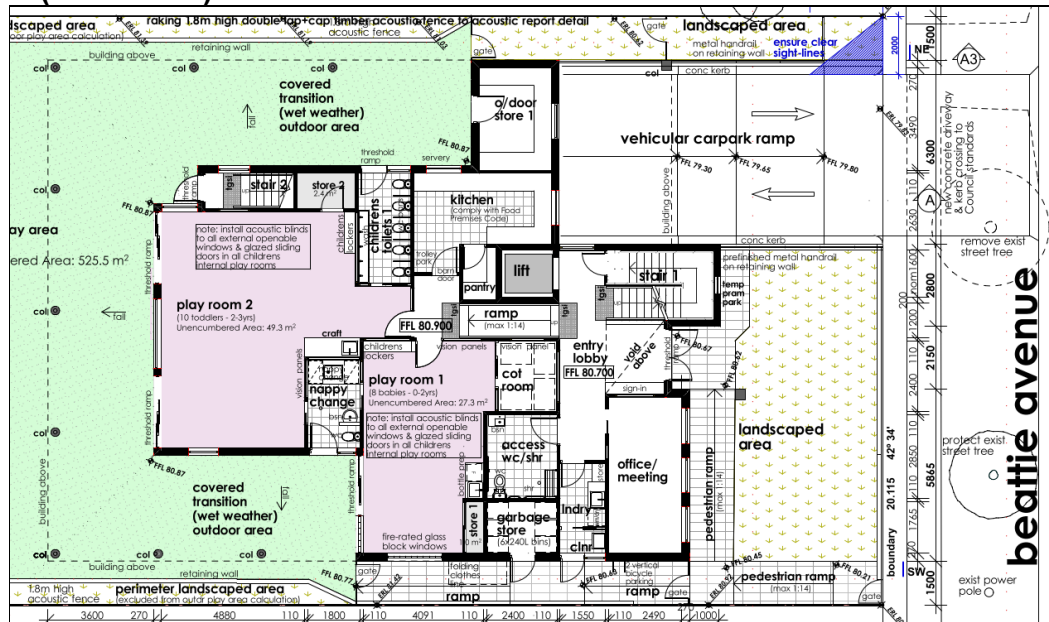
Extract of proposed basement plan Source: Archizen Architects Issue D dated 08-02-2021
